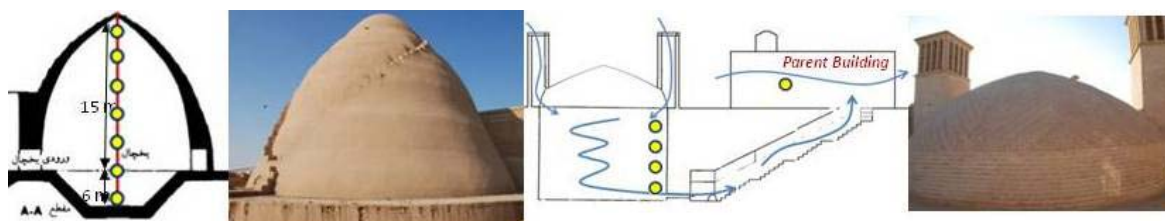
Picture and section: The ice-house – On the left, water-cistern which is restored as a museum and is connected to a building above the ground (called parent building) – On the right
